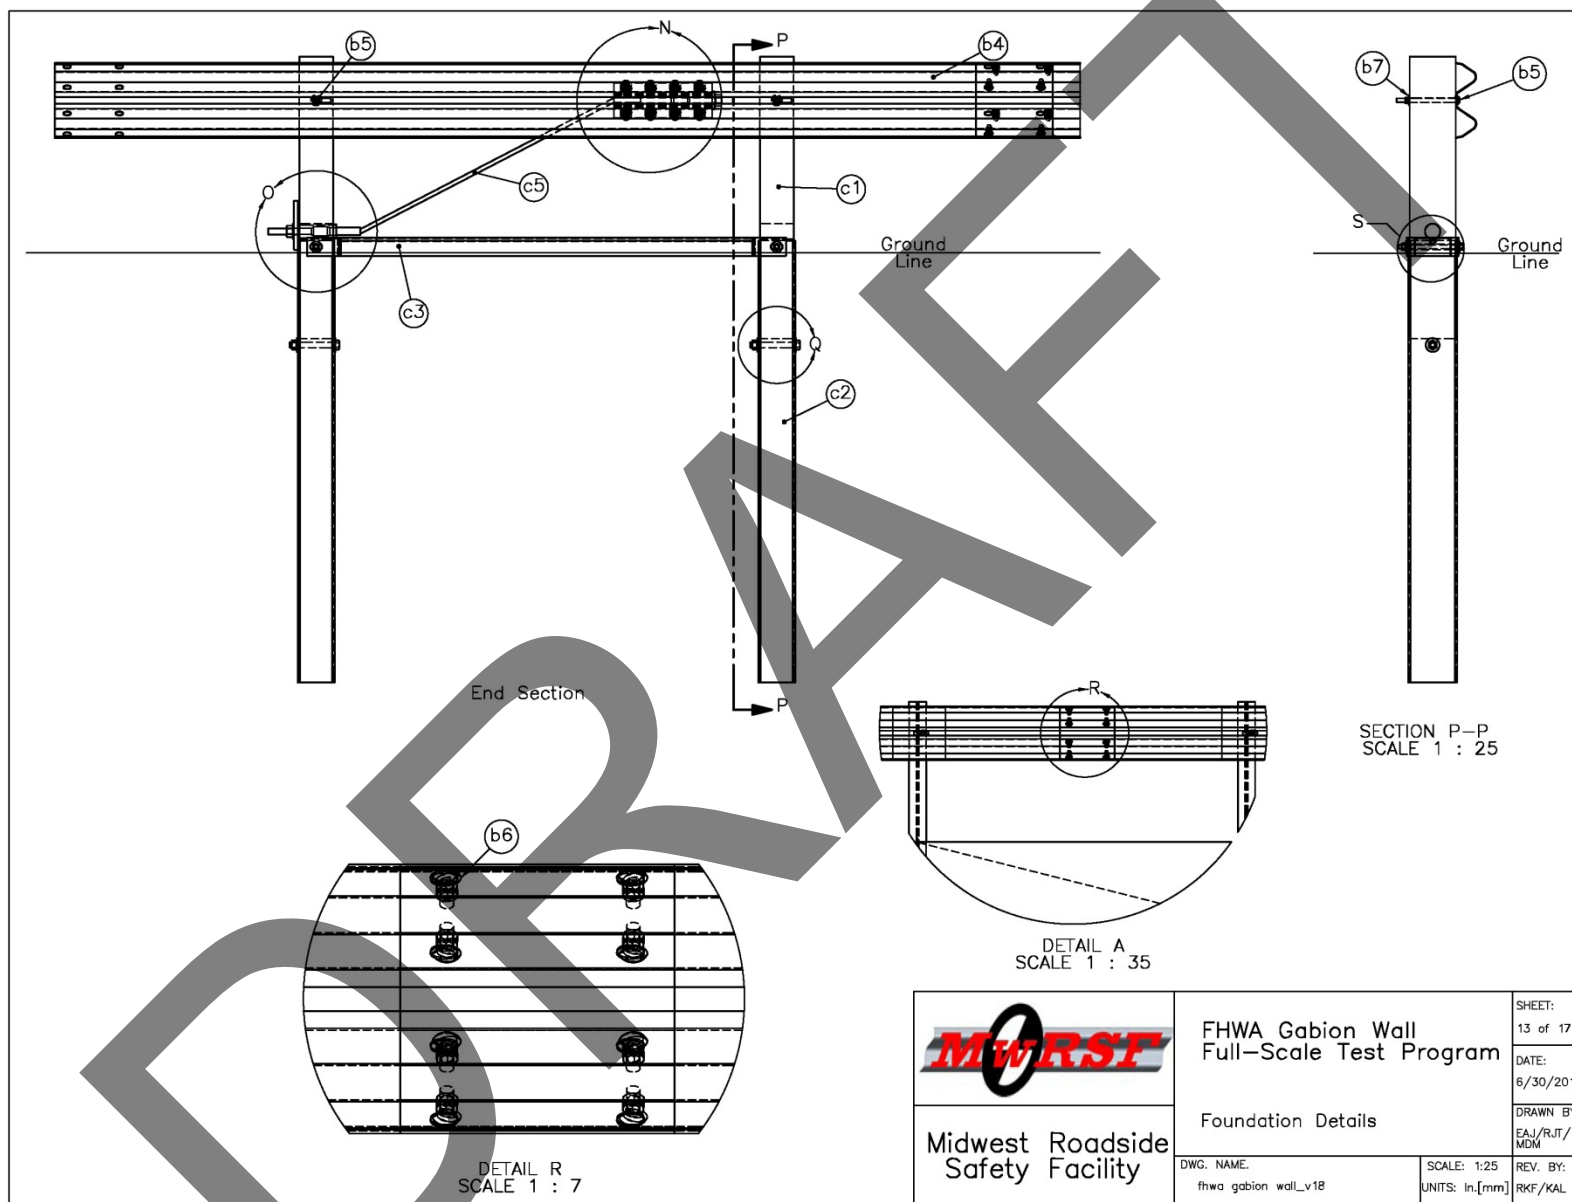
Schematic. Foundation Details, Test Nos. MGSGW-1 and MGSGW-2.
